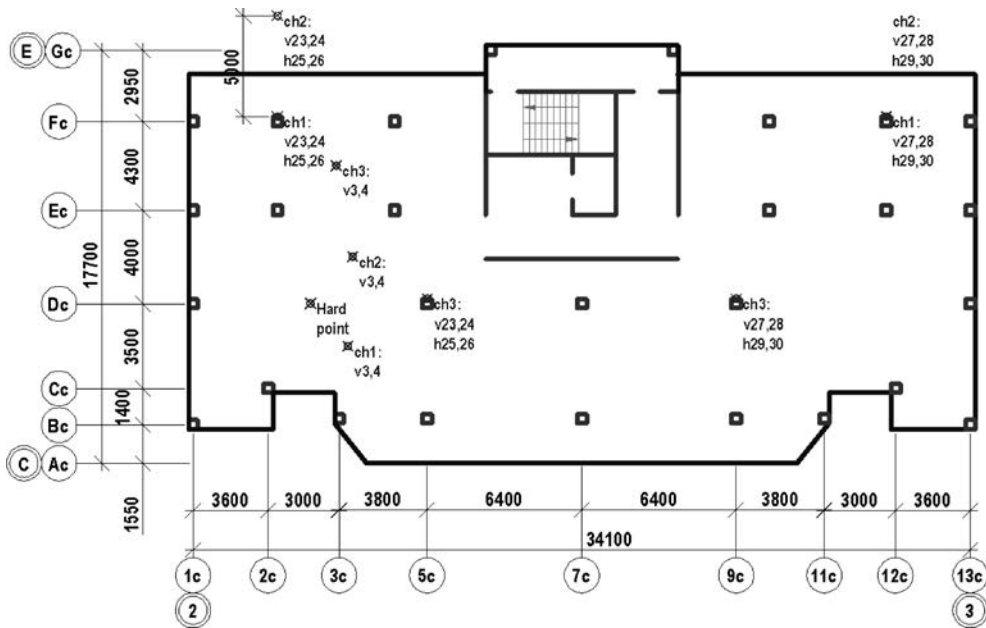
The constructive scheme of a typical floor of the fourth section of the 9-floor residential unit.
